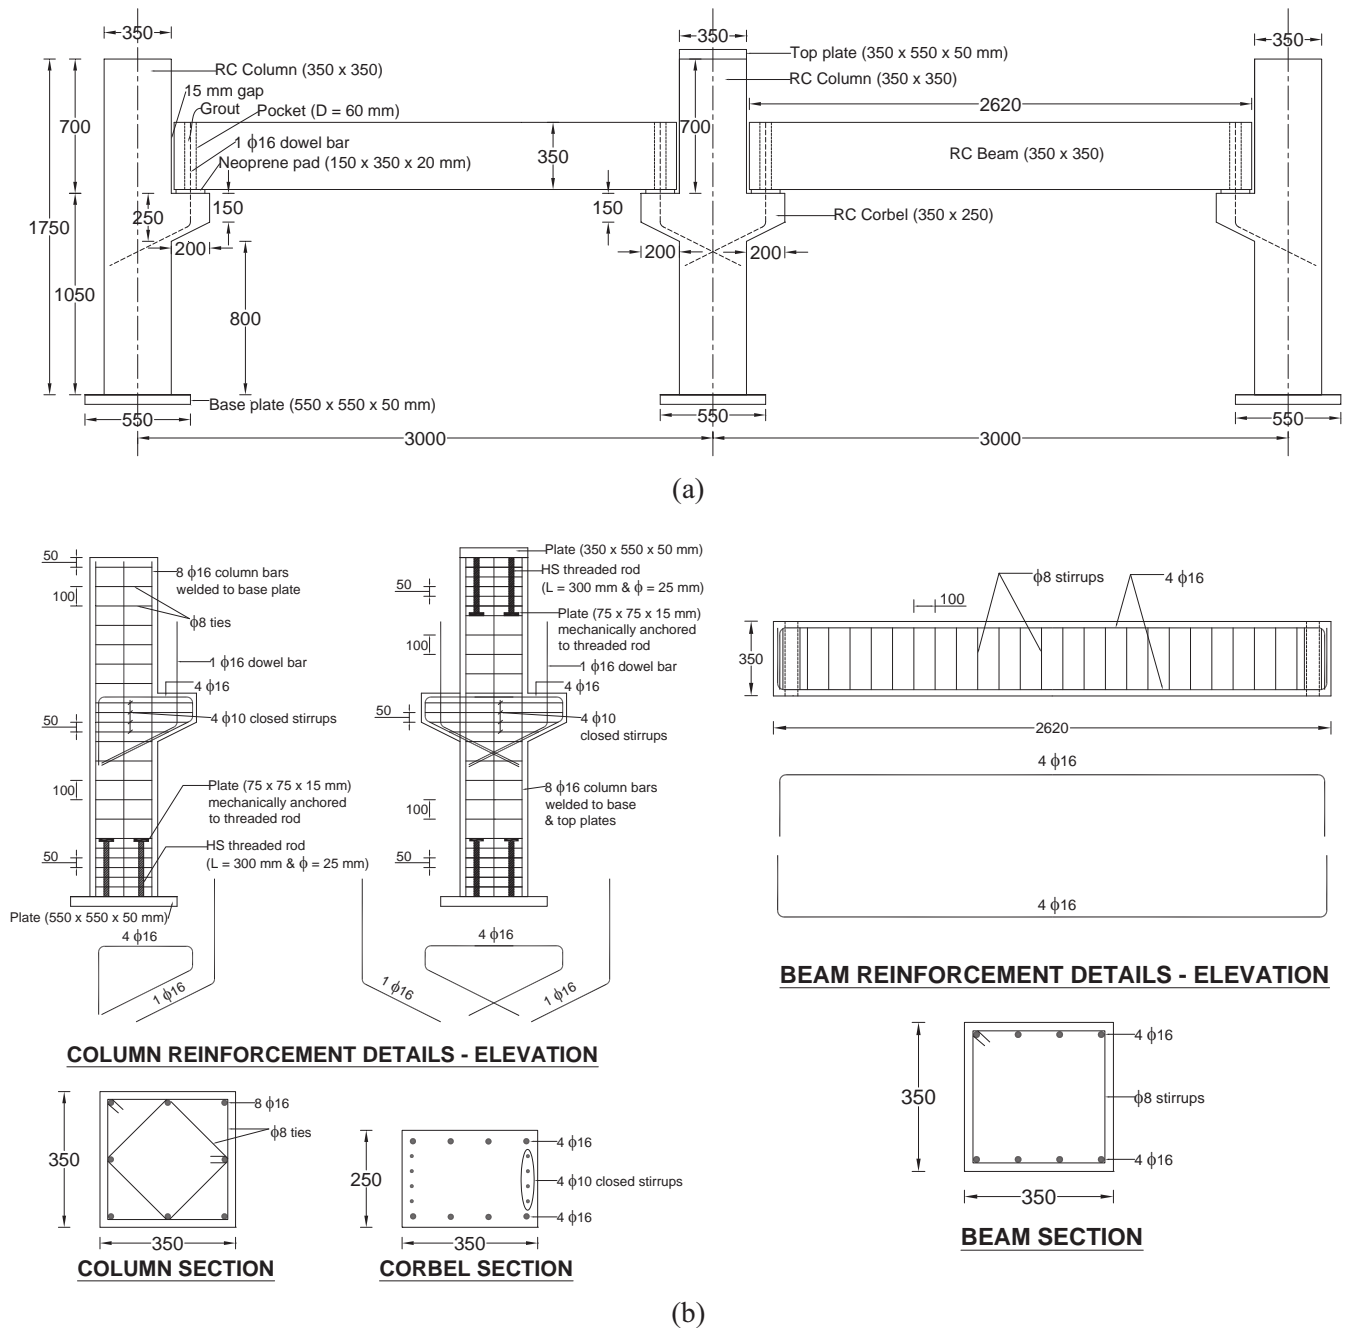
Details of precast specimen PC-C (Note: All dimensions are in mm): (a) Test specimen; (b) Reinforcement details.
